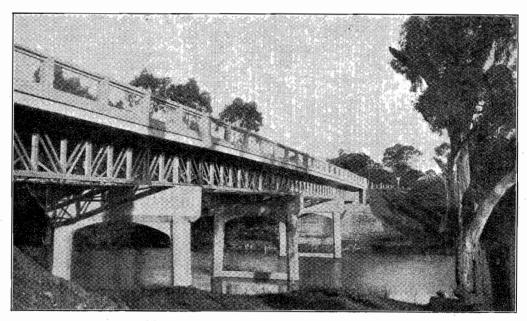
Hume Highway. Bridge over Sunday Creek.
